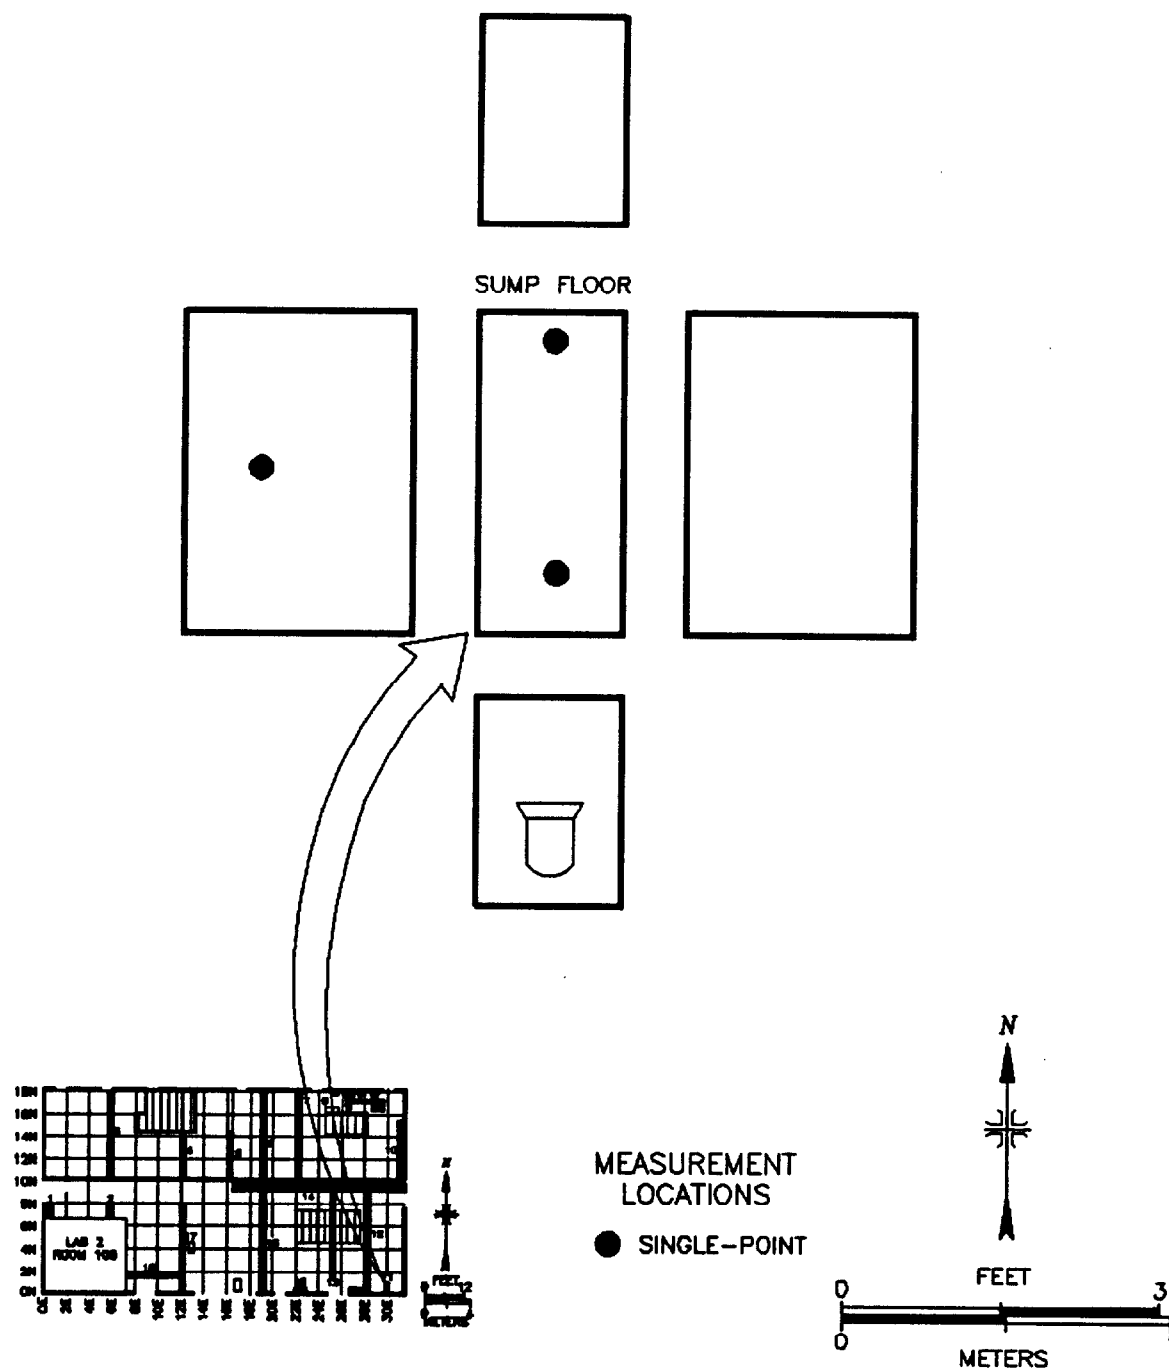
Building 23, Lab 1, Trench #11 (Sump) – Measurement Locations
